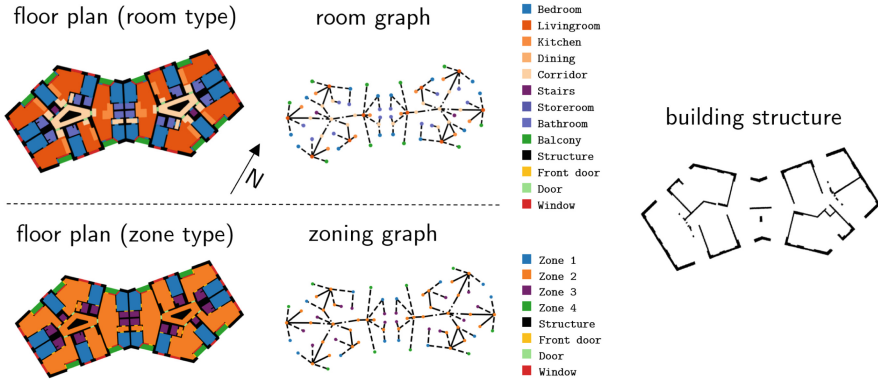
Representation of floor plan data. MSD contains three types of data. (Left) The floor plan is the complete layout of the floor of the building, including the position and shape of the rooms, doors, and windows. The areas are labeled by color (see legends). There are two category systems: 1) category is based on the type of the area (‘room type’), in which each area has a room type (e.g., “bedroom”); and 2) category is based on the zone of the area (‘zone type’), in which each areas has a zone type (e.g., “zone1”). (Middle) The associated room and zoning graphs are depicted on the right of the floor plans. The node colors are equivalent to the colors of the floor plan. The position of each node is taken as the centroid of the area that the node represents. (Right) A binary image of the necessary structural components of the floor plan.
